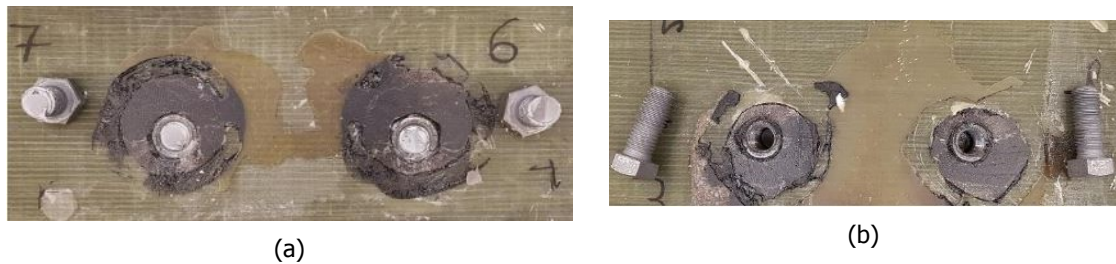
Typical pure bolt shear failure (a) and unfastened bolts (b) of the iSRR push-out test [1]
